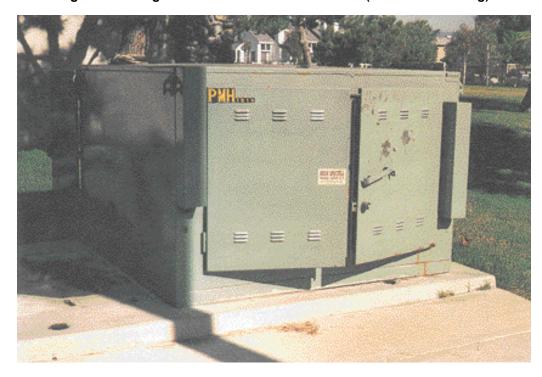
Close-Up of Light Corrosion on Bottom of Door (No Serious Pitting)
